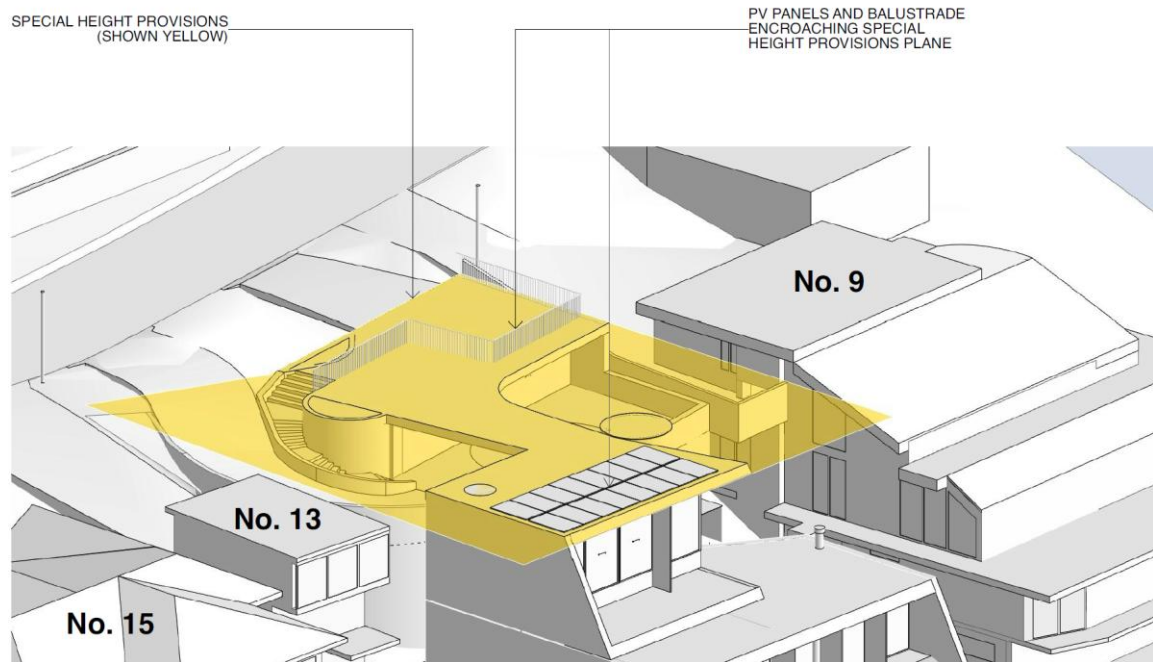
the special height provision exception relates to the steel balustrade, western driveway upstand, solar panels, landscape elements upon the roof
